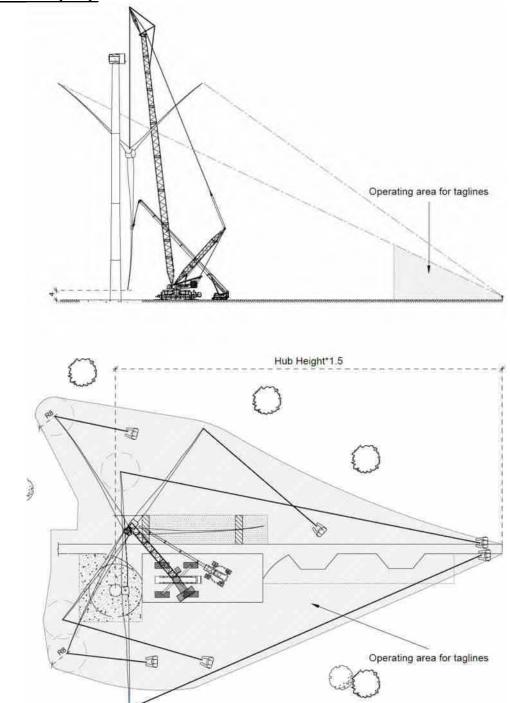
Indicative drawing of area requirements for the use of tag lines with rotor assembly installation method (Rotor assembled next to hardstand).
